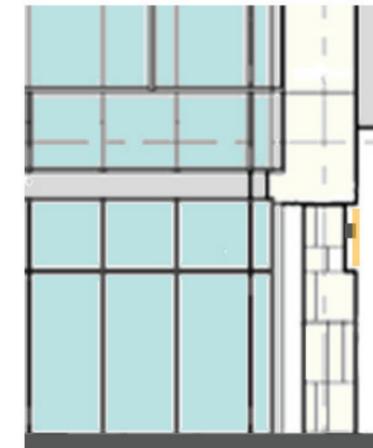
Section of retail signage placement, types 8-1A to 8-3
